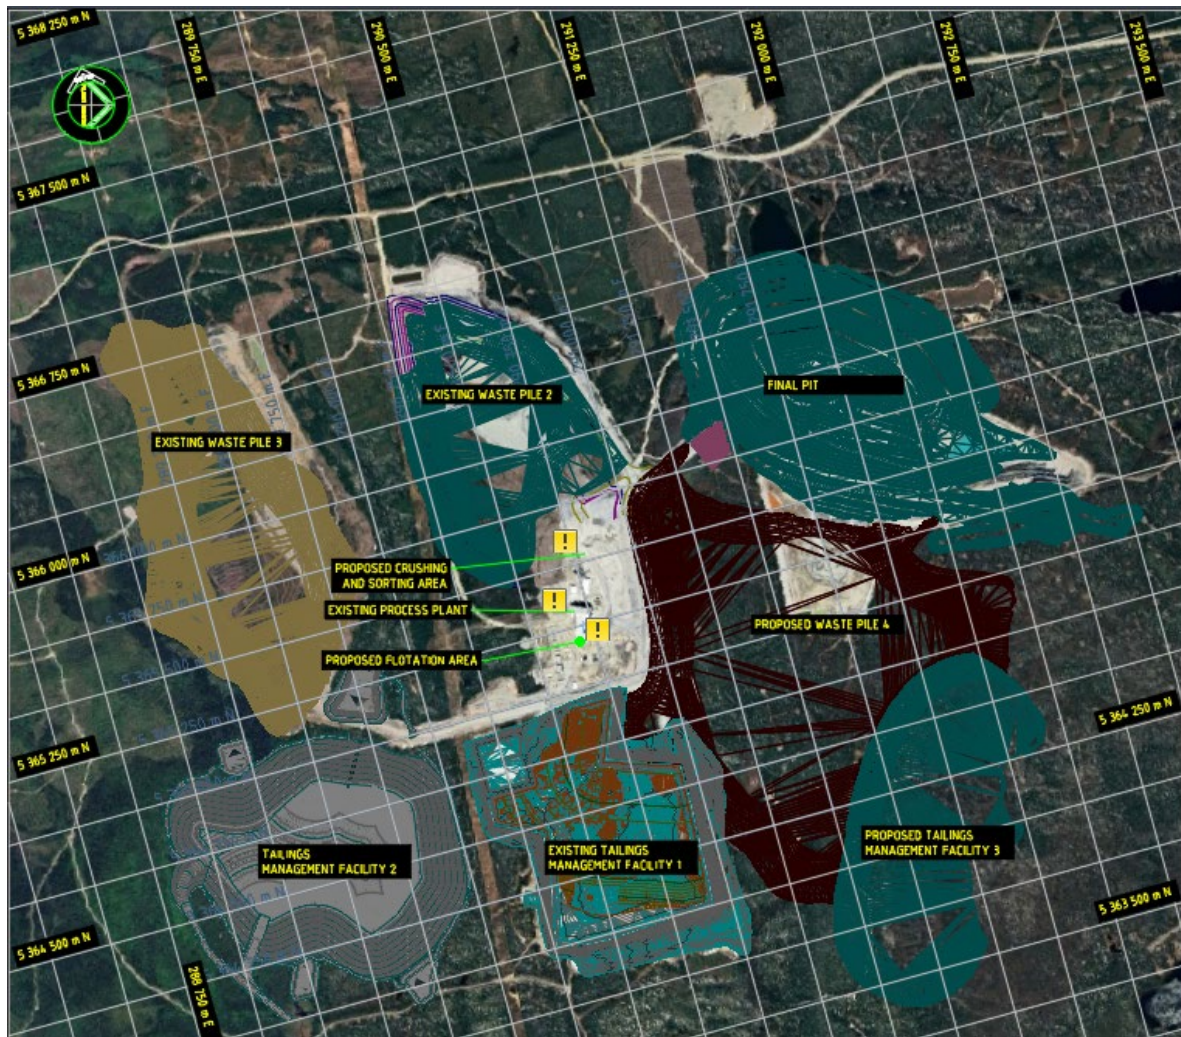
General Arrangement of Existing and Planned Infrastructure at the Mine Site
